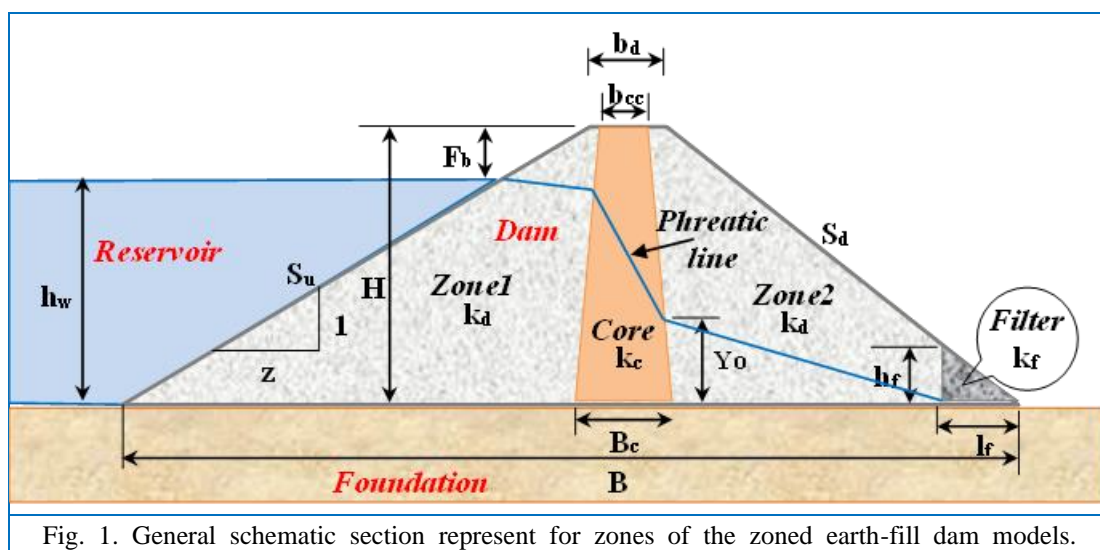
General schematic section represent for zones of the zoned earth-fill dam models.
